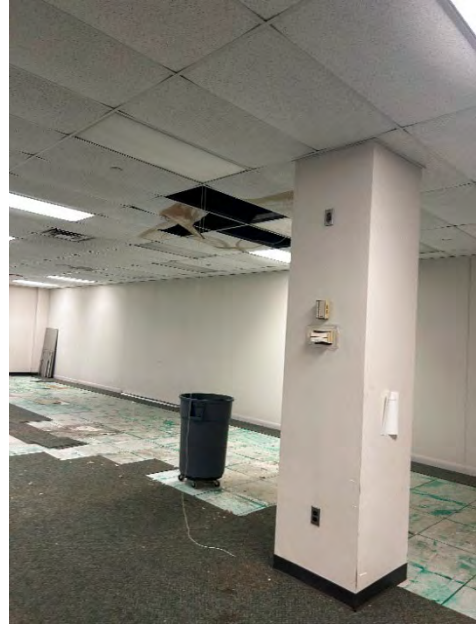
(Left) – Open concept floor plan of the old Data Center.
